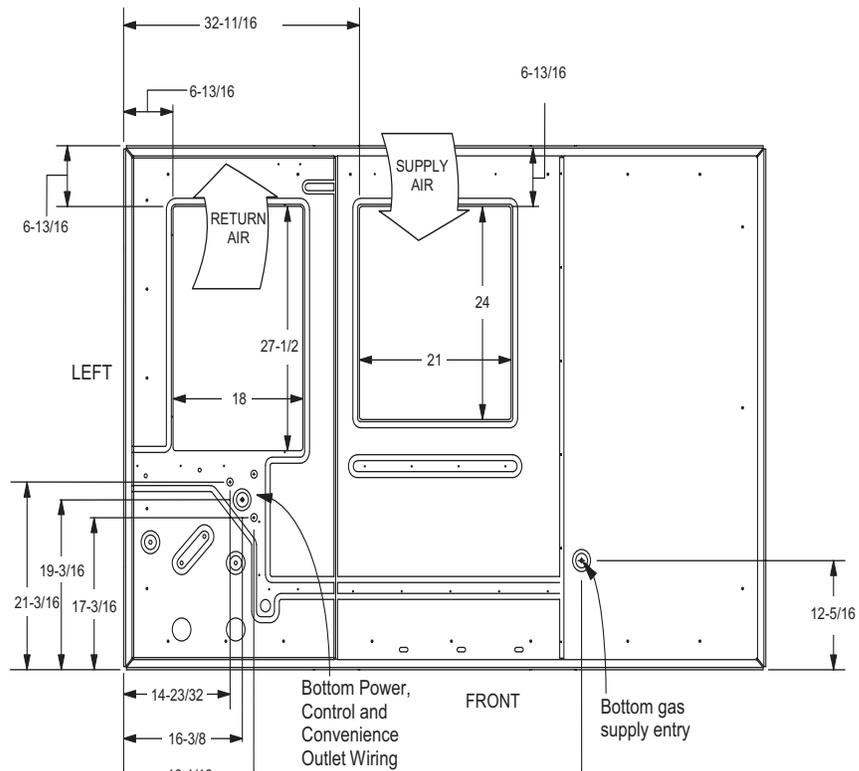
BOTTOM DUCT OPENINGS (FROM ABOVE)
